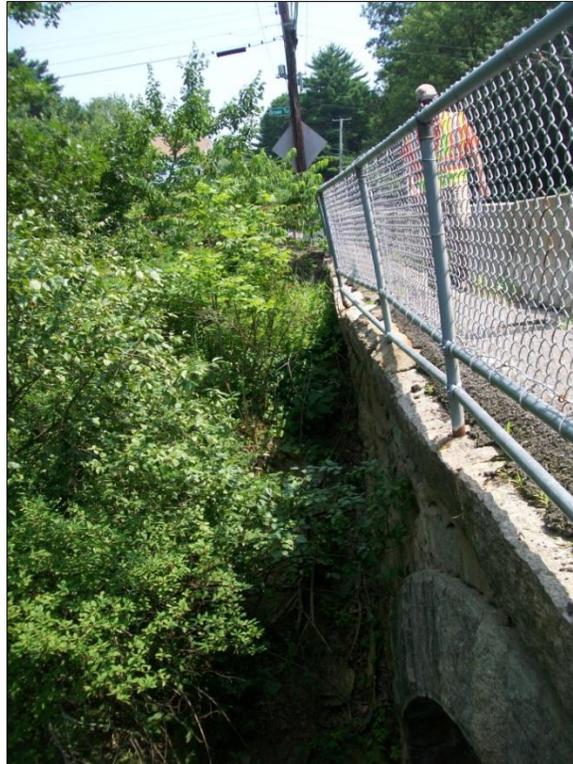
Looking South: Displacement of Top of East Spandrel Wall and Fence
